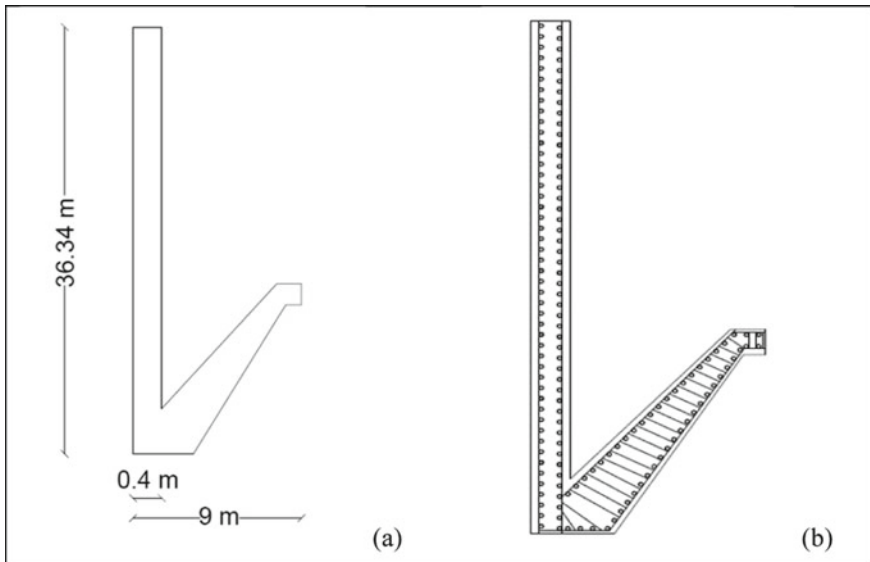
Geometry of RC silo: a sectional elevation and b reinforcement details
